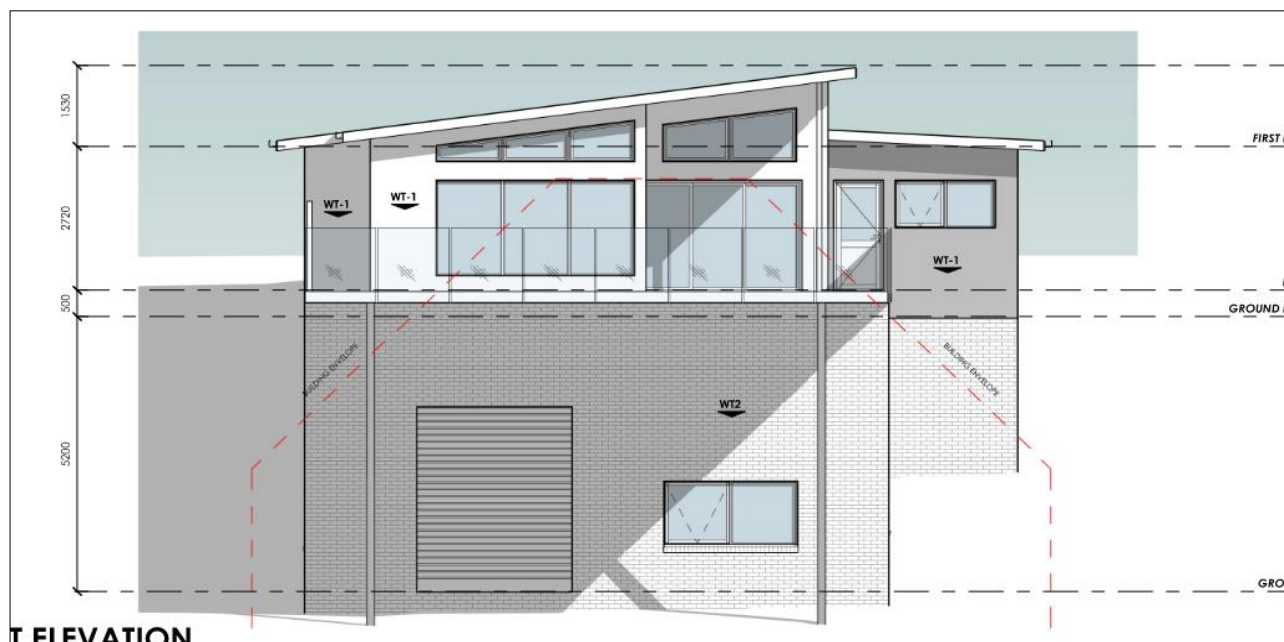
East elevation with acceptable building envelope shown in red (n + b, 2021)
